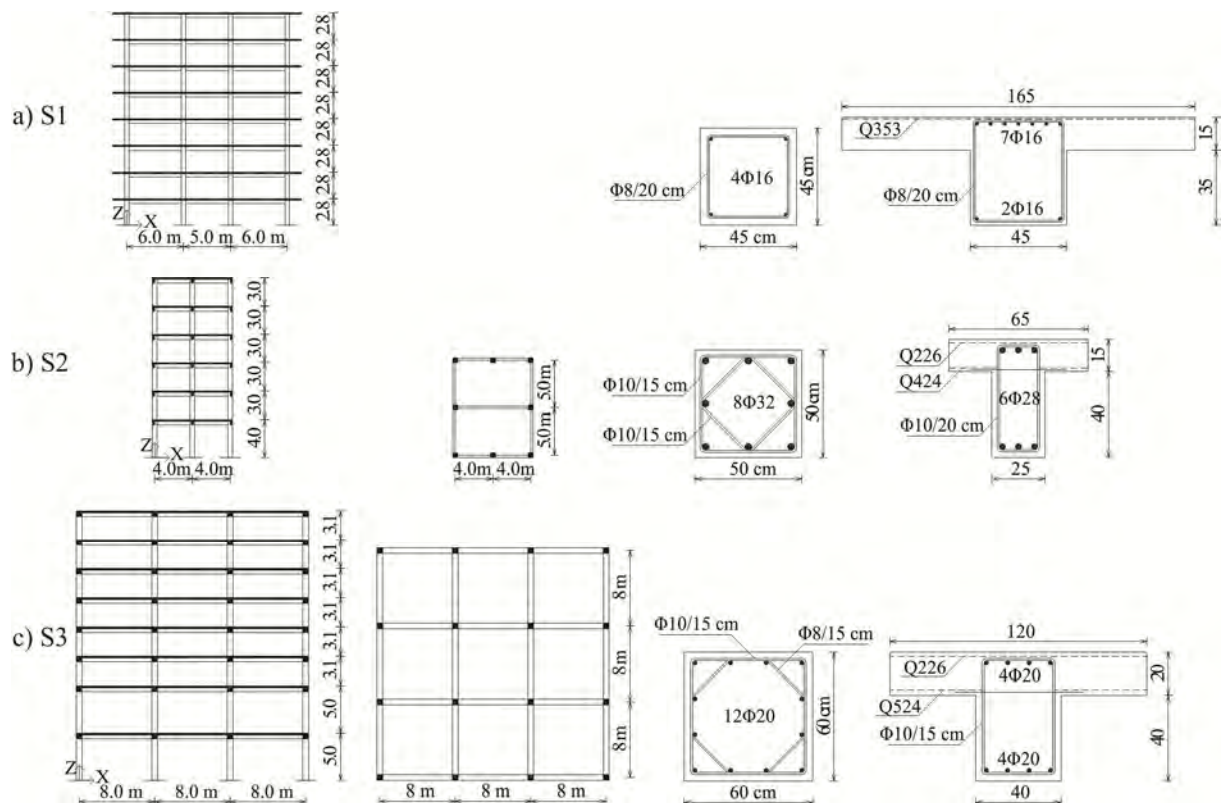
The elevation, plan view and the reinforcement in typical cross-sections of the columns and beams for a) eight storey frame, b) six-storey and c) eight-storey RC building.
